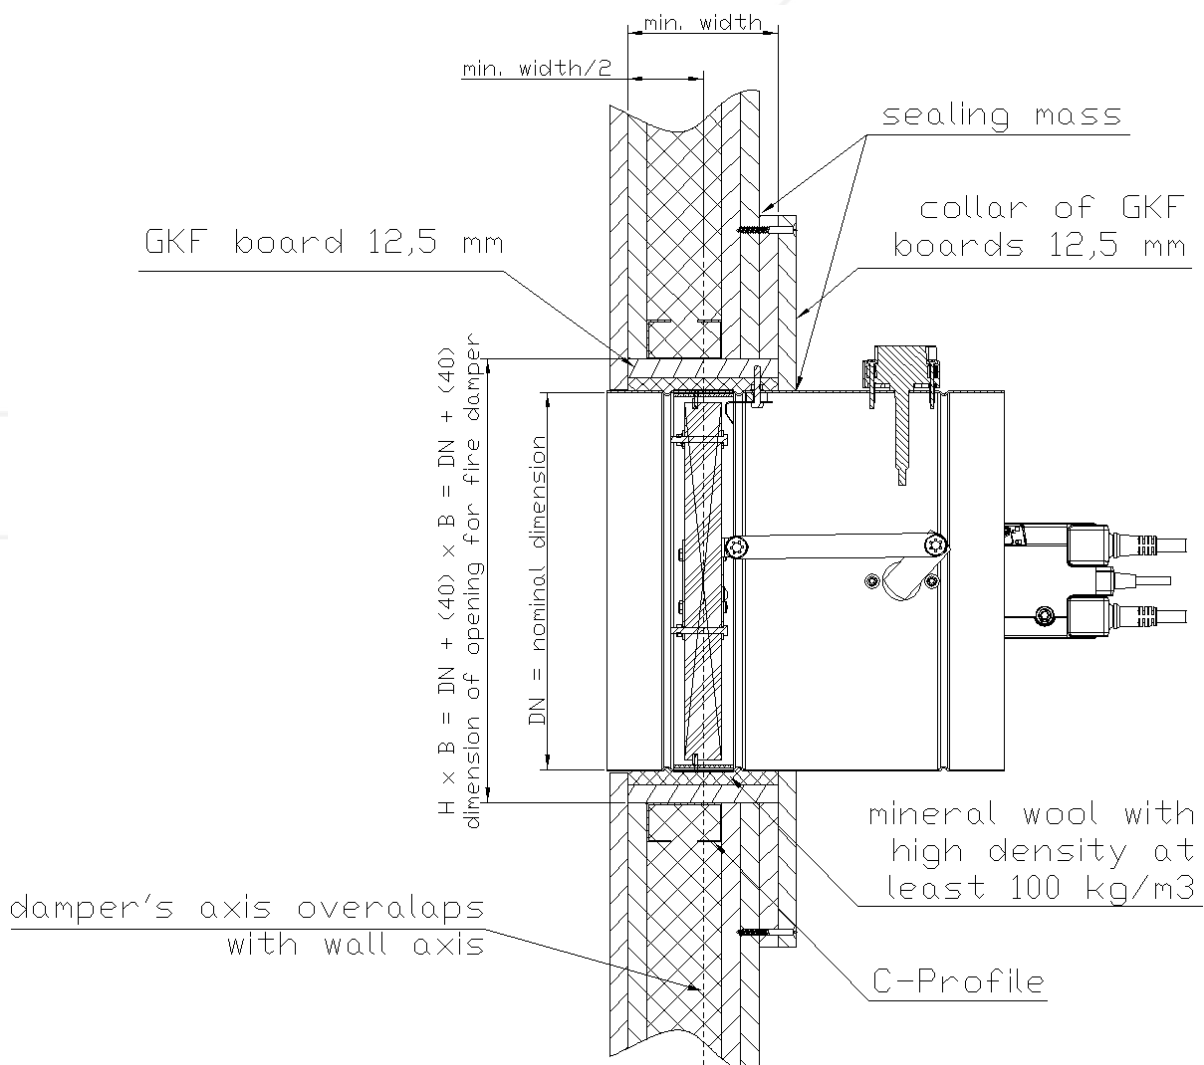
Installation method of fire dampers KTM-O in flexible walls structures one-sided access
